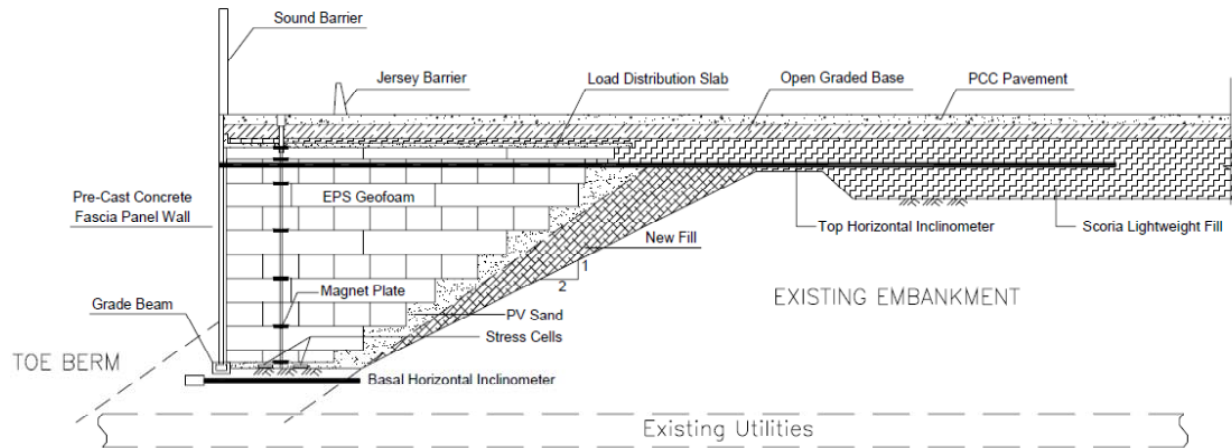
Cross Sectional View of the EPS Embankment and Instrumentation at 100 South Street, Salt Lake City, Utah, I-15 Reconstruction Project (Negussey and Stuedlein, 2003).
